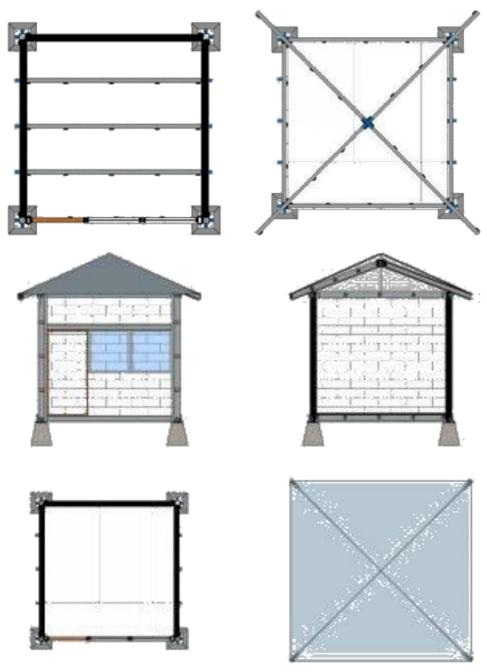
Plans, Views and Sections Principles of RISe-UP design.
